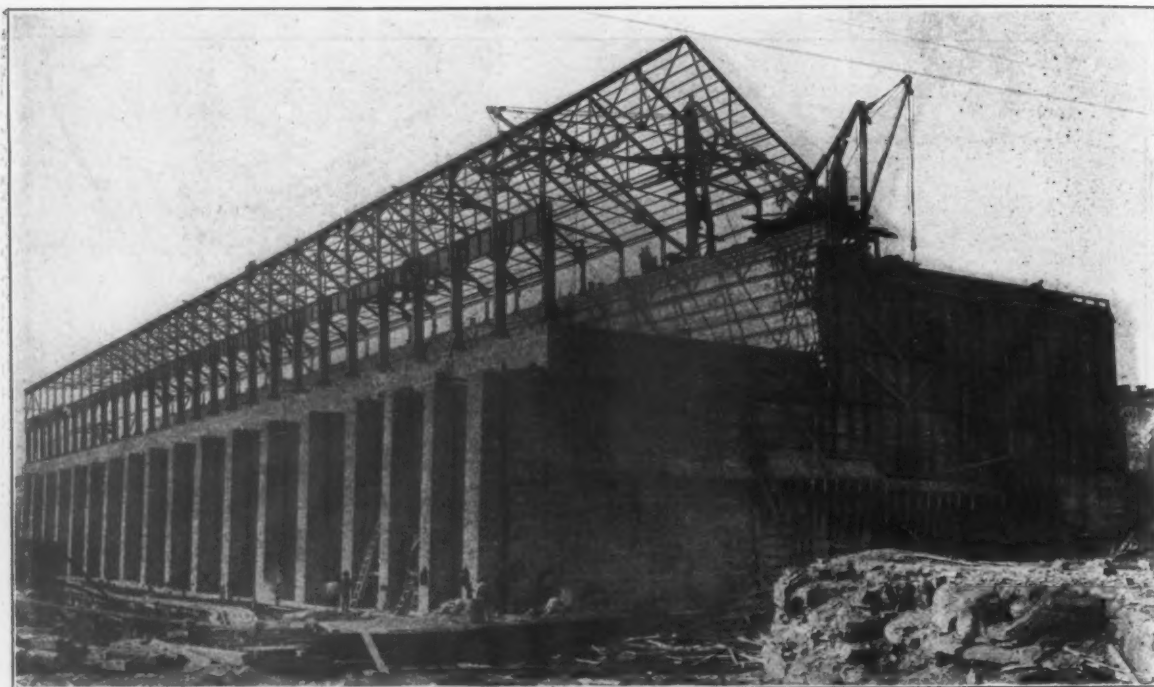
Power House, Showing Dividing Walls of Tail Race.
